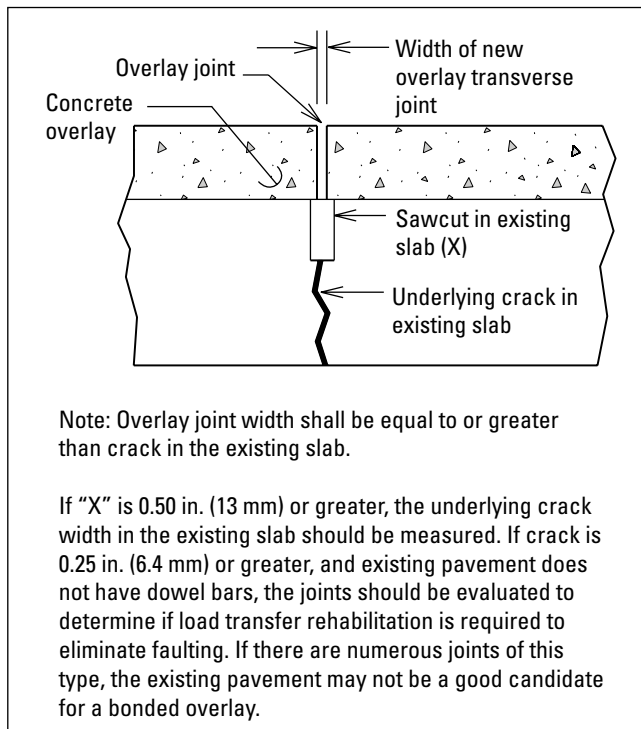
Joint sawcut details for bonded concrete overlays (Harrington and Fick 2014)
